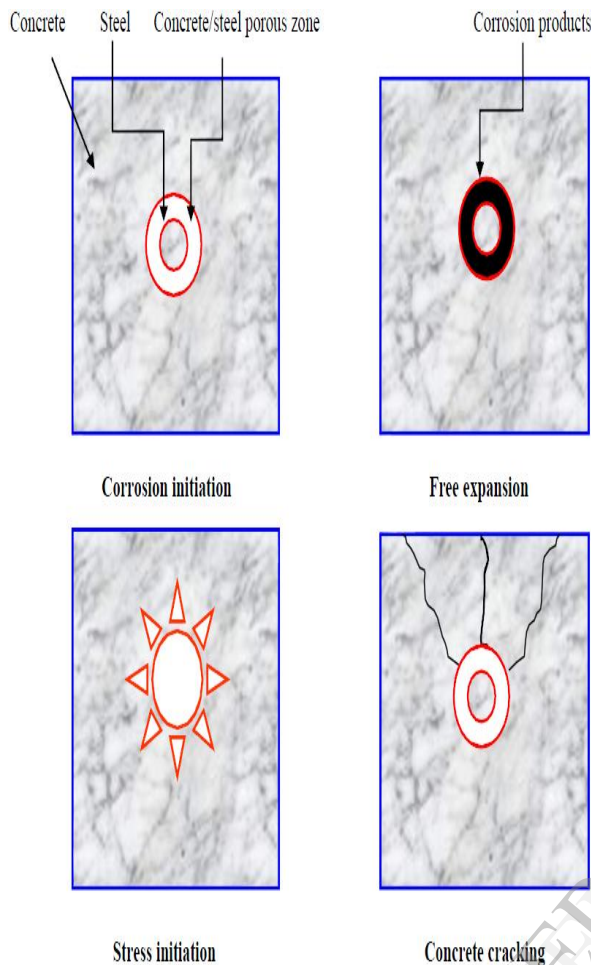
Schematic illustrations of damaged concrete resulting from steel corrosion (Adapted and modified from [7])
